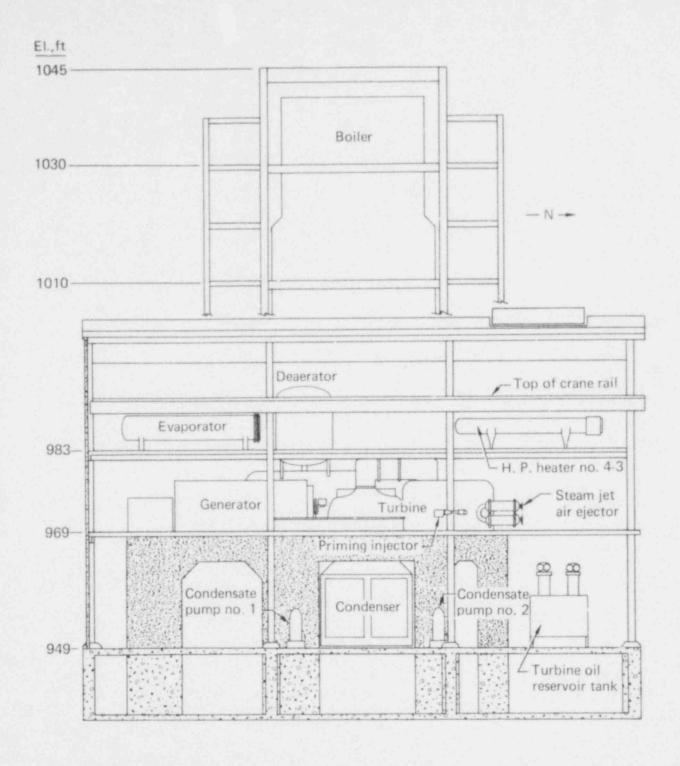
Elevation dr wing, looking west at column line 3, of the El Centro Steam Plant, Unit 4. Note: boiler tower in background is an elevation at column line G. See Fig. 20 for column line locations.
